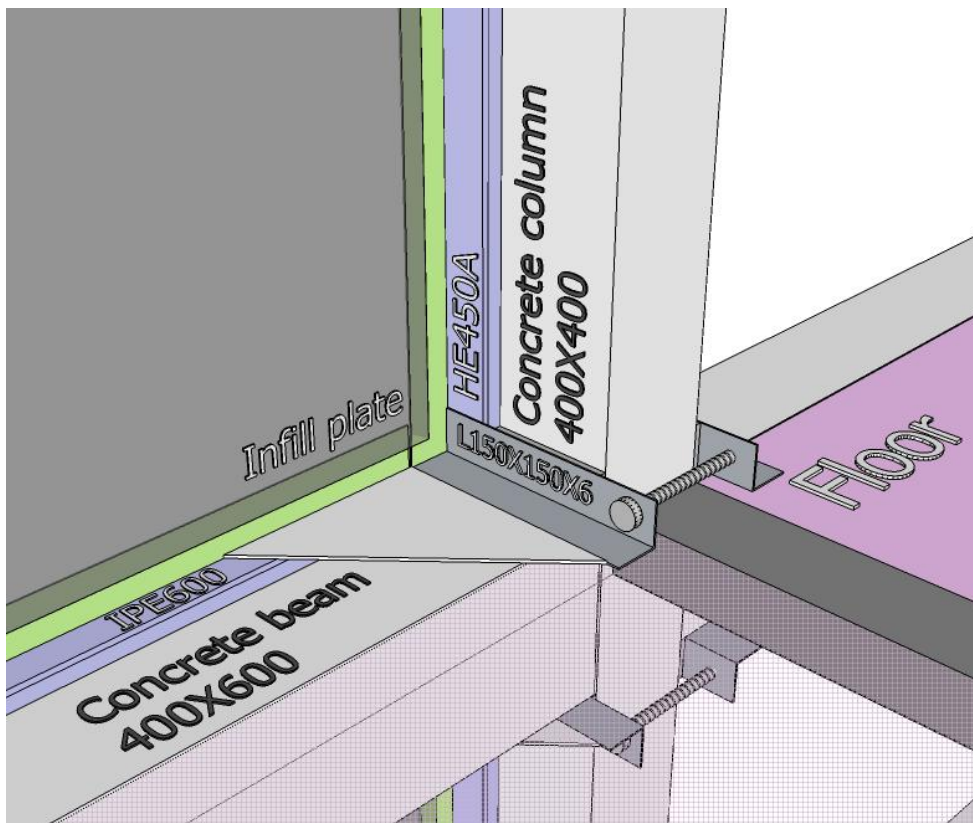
Proposed connection principle between the external frame and the concrete frame.
